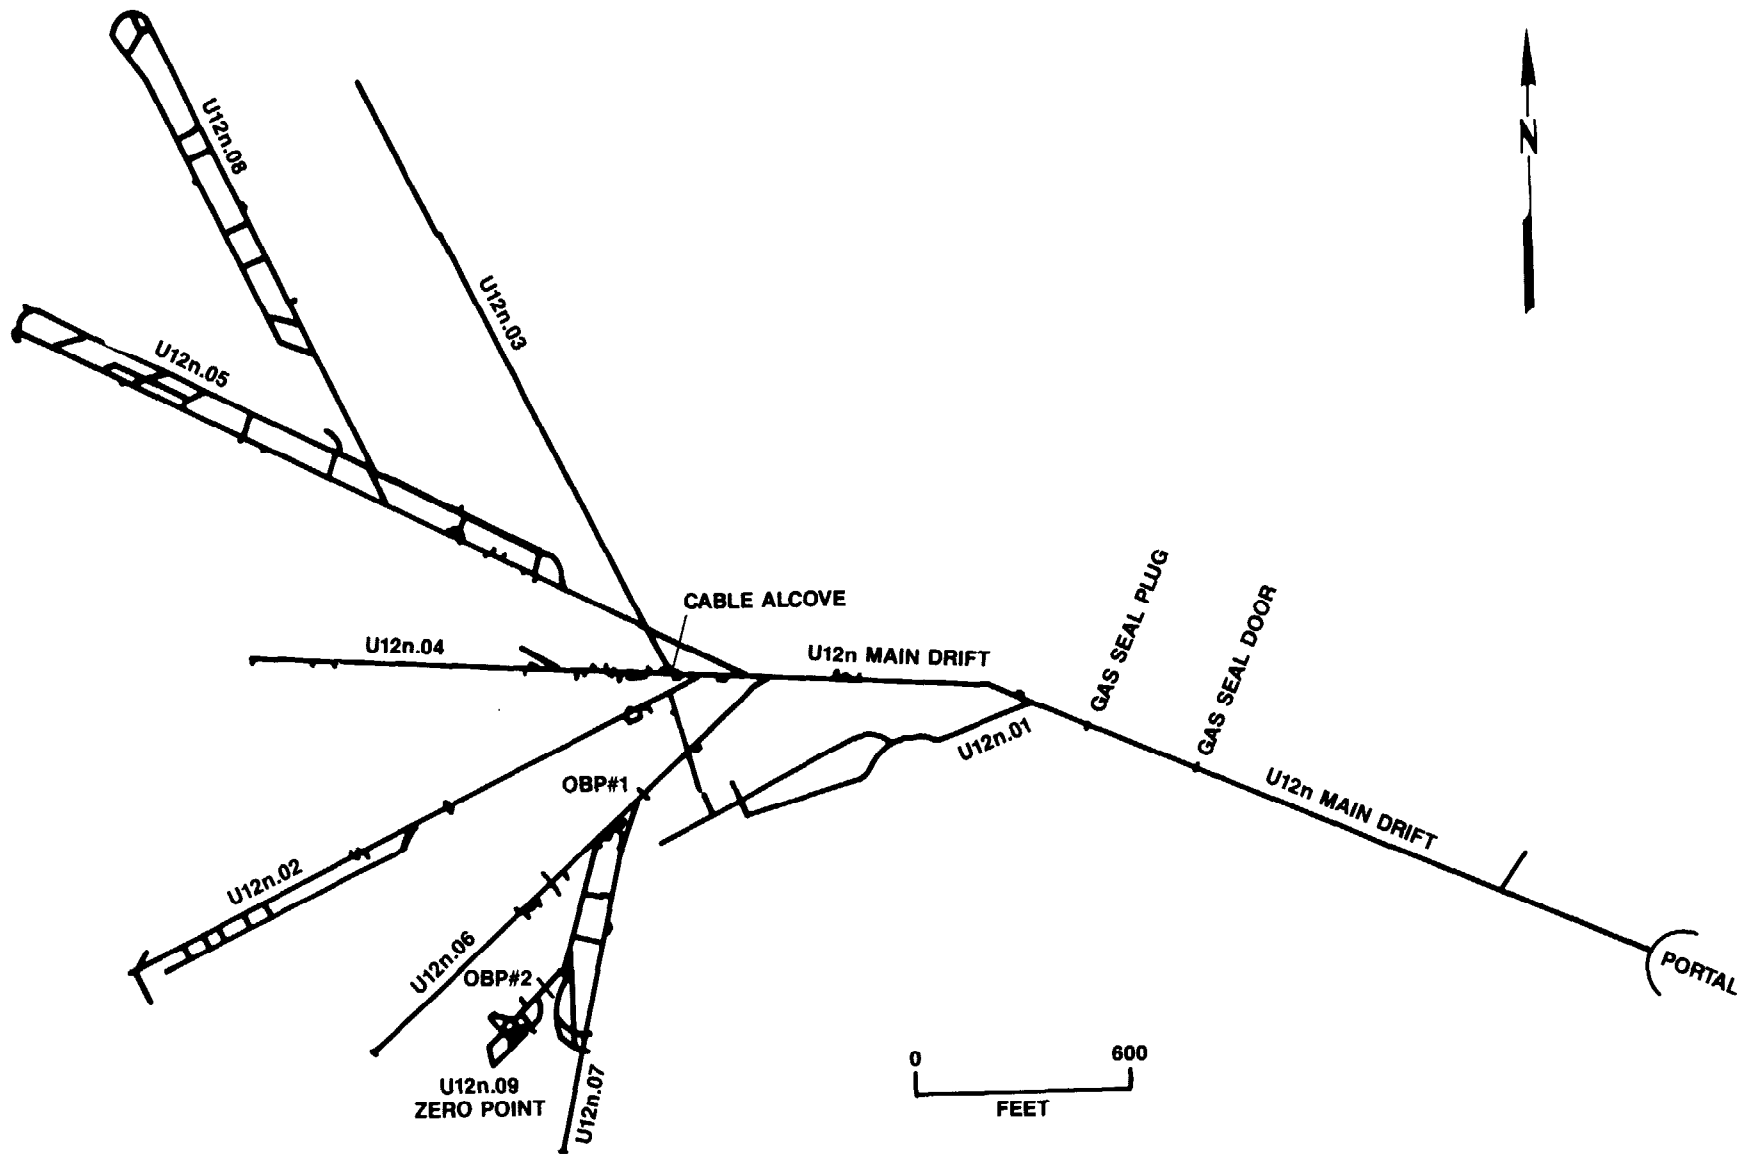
HYBLA FAIR Event - Tunnel Layout
